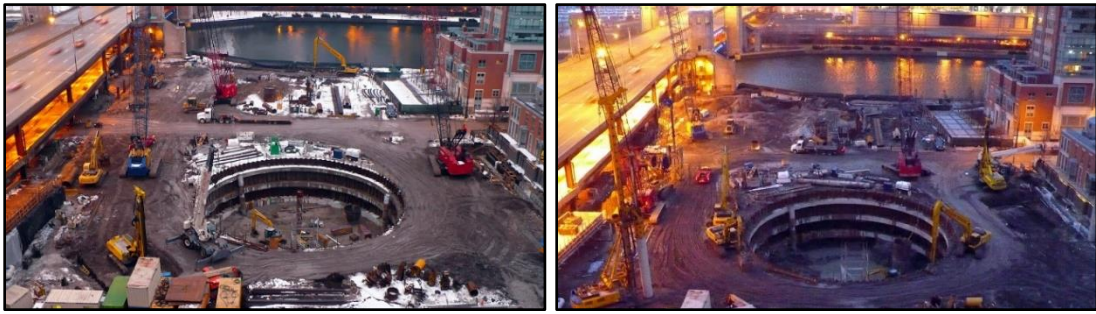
Castings concrete RB1 and Second excavation (from +0.219 to -2.857 CCD)
